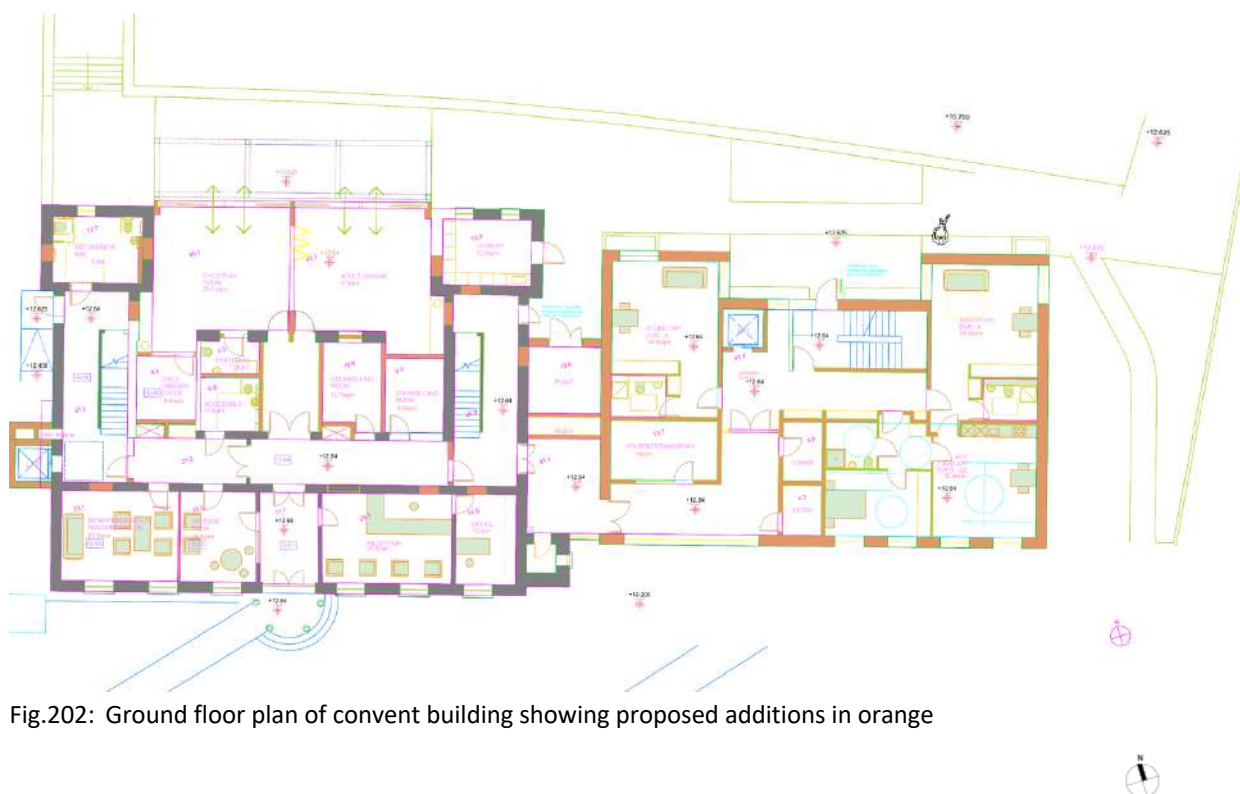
Ground floor plan of convent building showing proposed additions in orange
